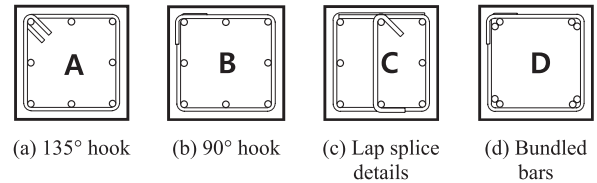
Stirrup Details of Square Columns (Kim et al 2015)
